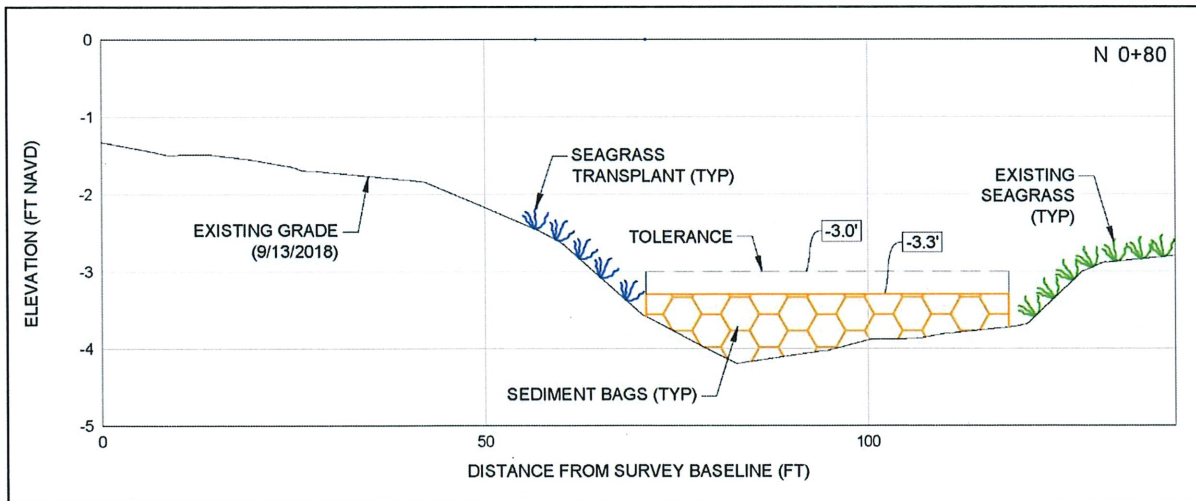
Typical Cross Section of Permitted Mitigation Site North
